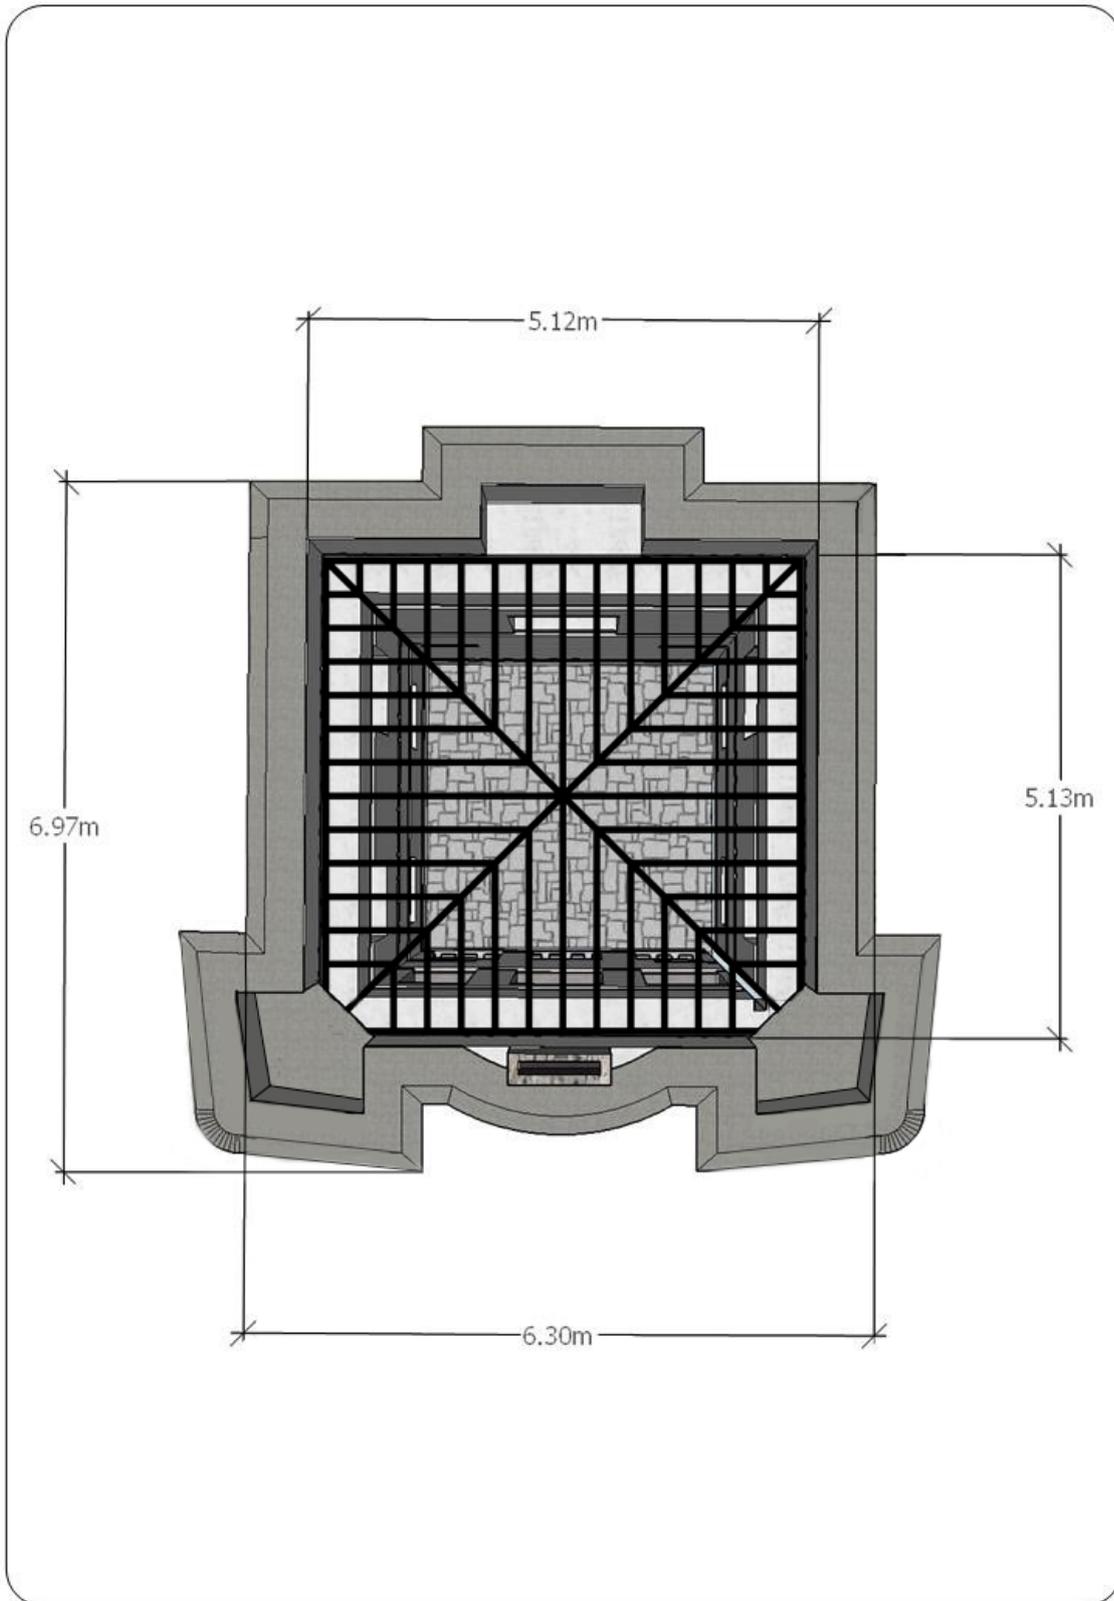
A different possible layout of timber joists supporting flat roof, using staggered joists connected to diagonal beams running from corner to corner.
